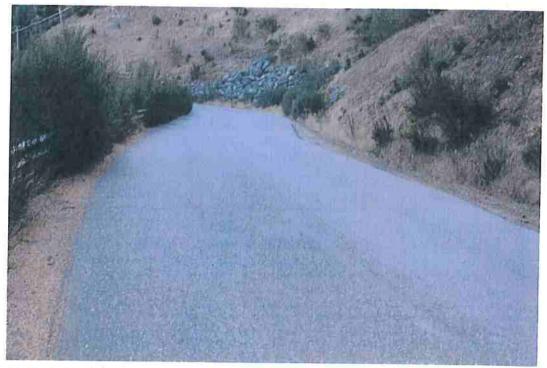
Mile 2.8: 18-ft road width with 1-ft shoulders.
